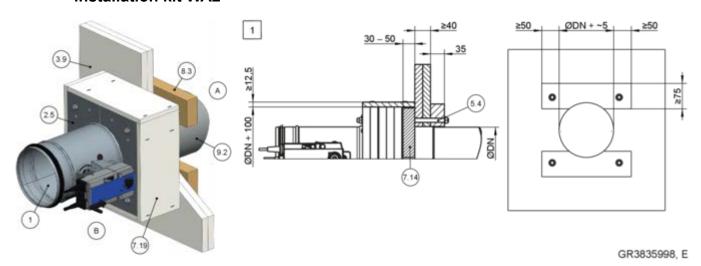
Dry mortarless installation into a shaft wall without metal support structure, with installation kit WA2
